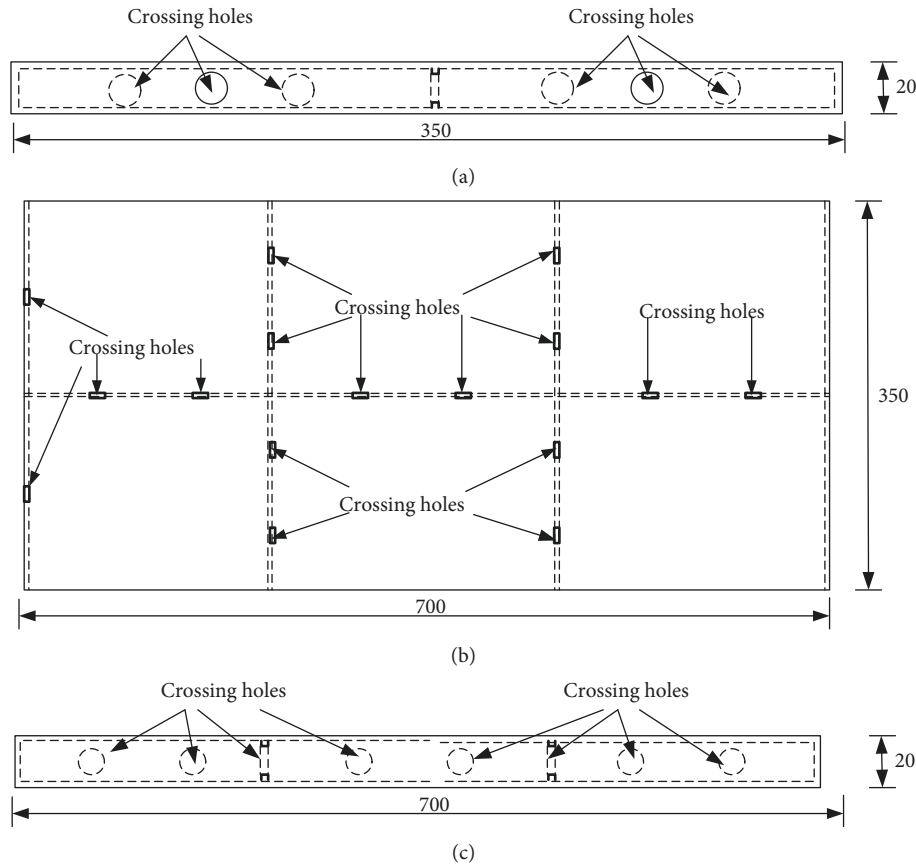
Shape and sizes of the test specimens. (a) Side view of specimen. (b) Top view of specimen. (c) Front view of specimen.
